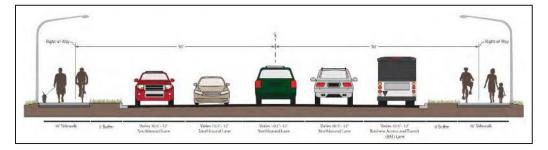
SR 303 Corridor Study Proposed Section, Warren Avenue Bridge to Callahan Drive
